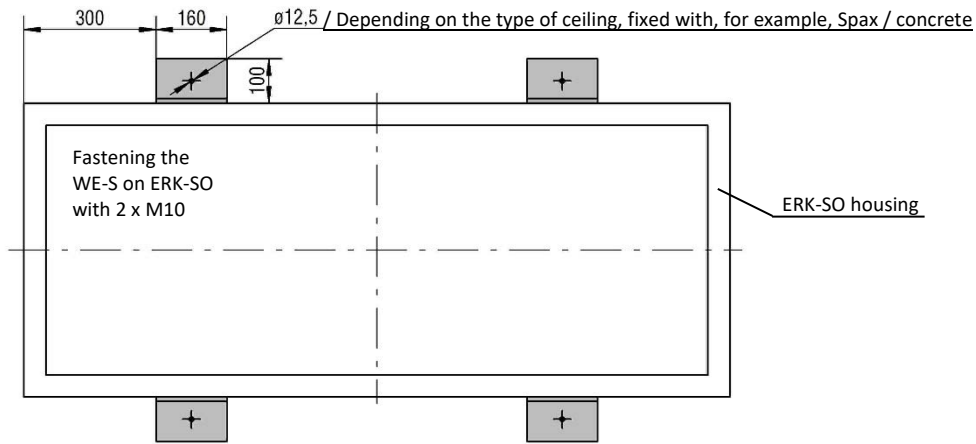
Arrangement of WE-S when installed in solid ceilings
